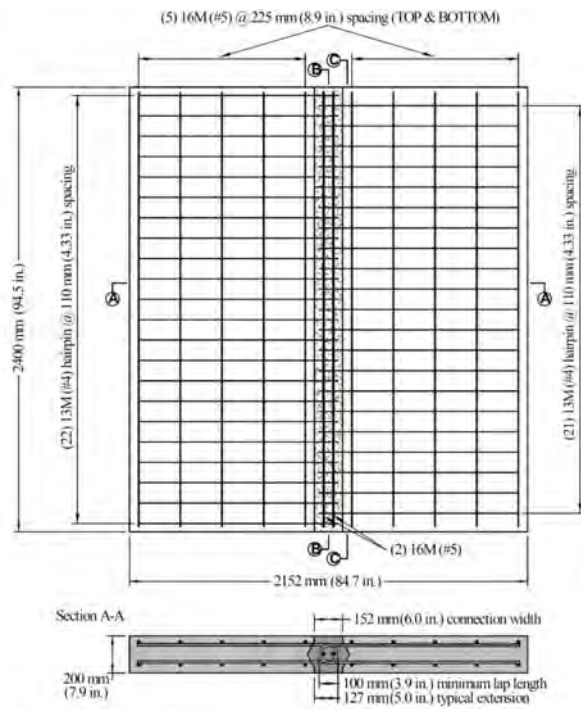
Hairpin detail and panel layout used in FHWA study HRT-11-023
